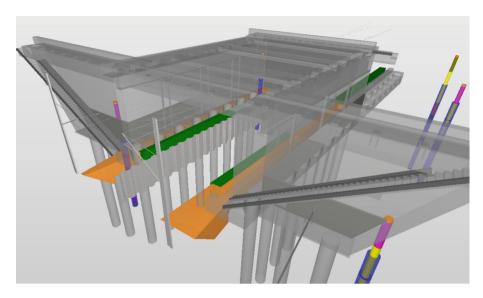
Detailed model of the BIM pilot project Highway A99 Bridge 27-1
